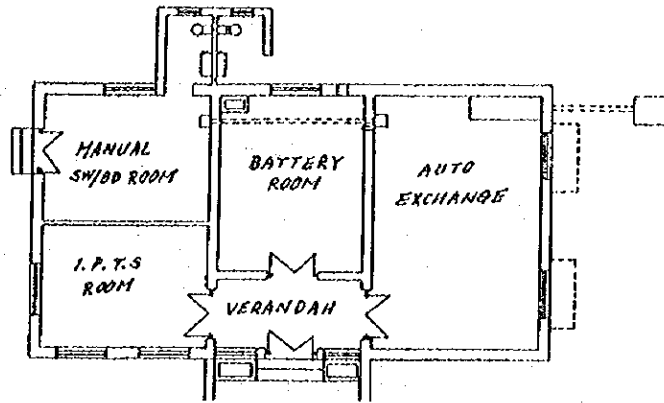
·1 Plan of Type B Dependent Exchange Building
